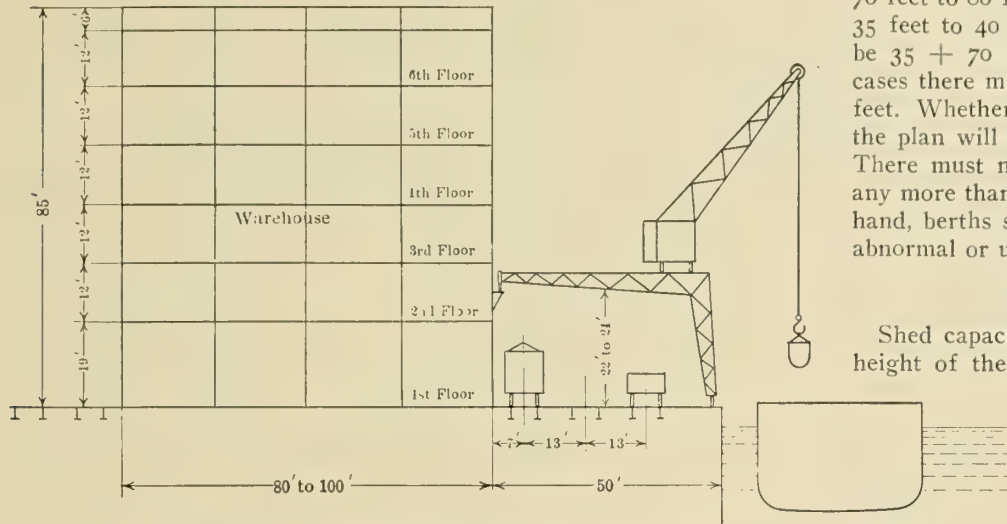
Section Through Warehouse with Immediate Waterfront Area (C-C Fig. 2)
